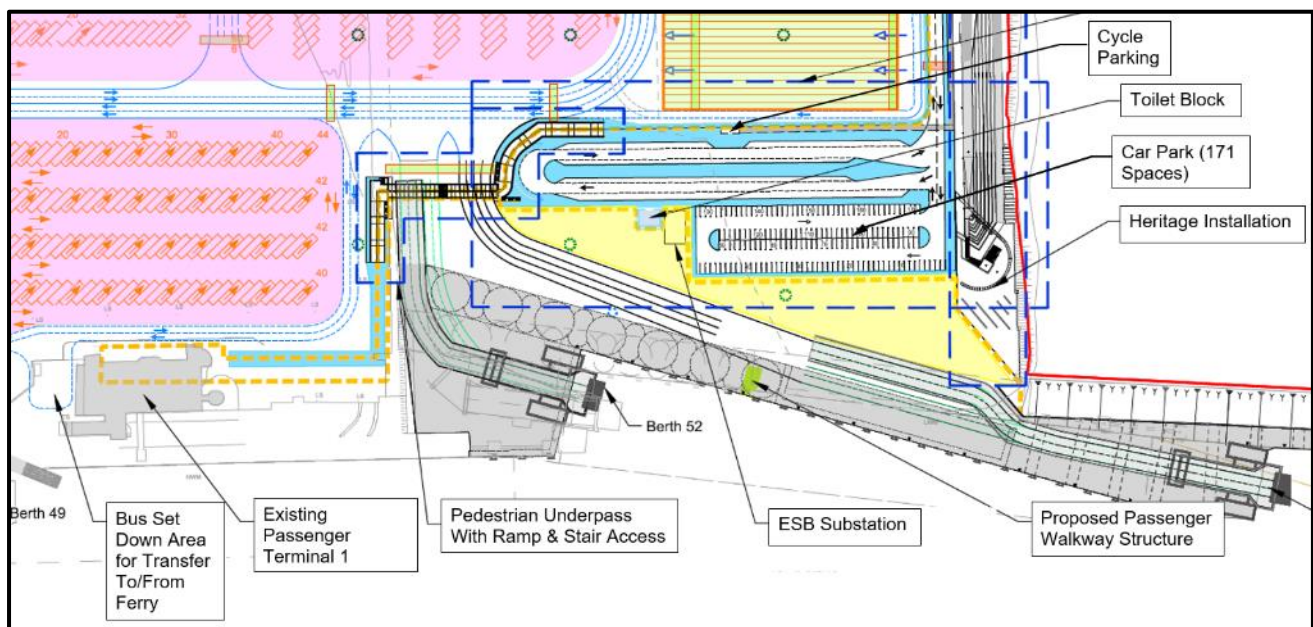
Section of Proposed Layout of UFT - Bus Turning, Car Parking and Pedestrian Walkway to Terminal 1 Building
